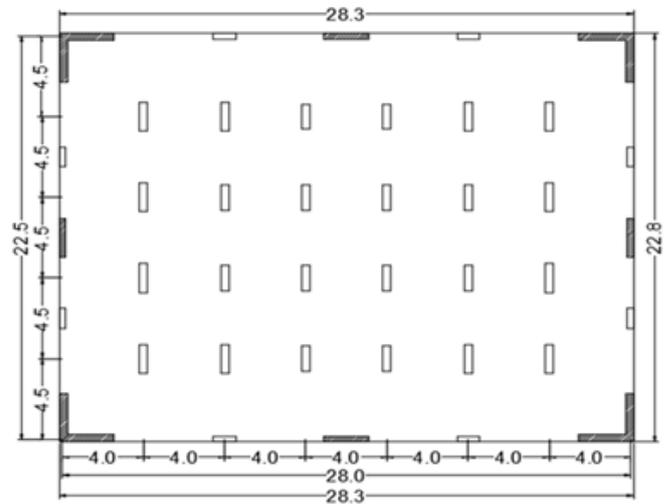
Model (6) Building with Shear Walls at Corners as well as the center of the exterior perimeter
